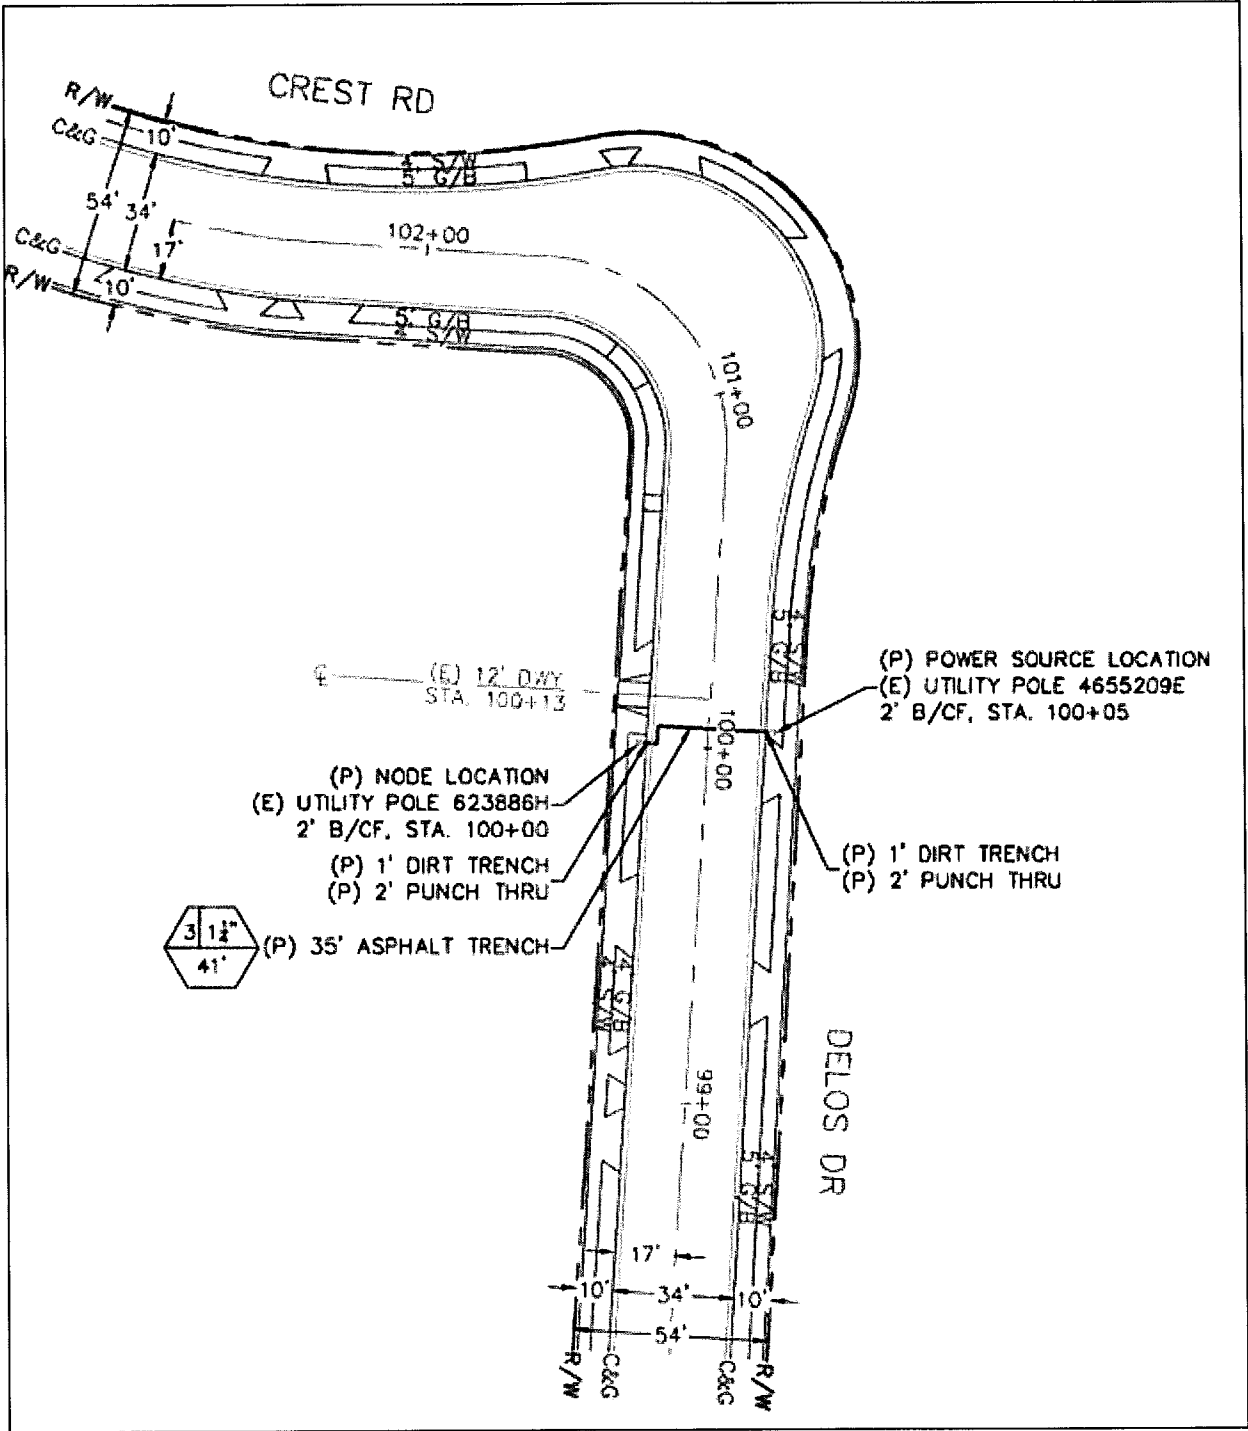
Underground electrical connections for the Applicant (Source: Plans Page C-02, Panel A-1).
